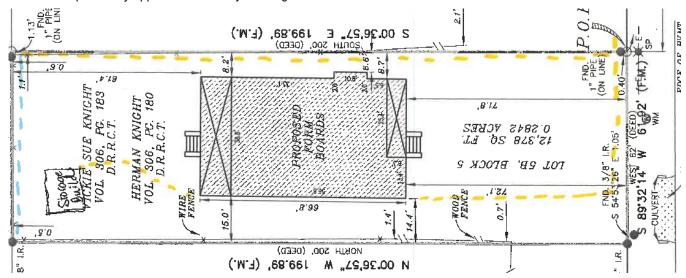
SITE PLAN OF FENCE LOCATIONS. (BLUE: WOOD; YELLOW: VINYL PICKETS)
